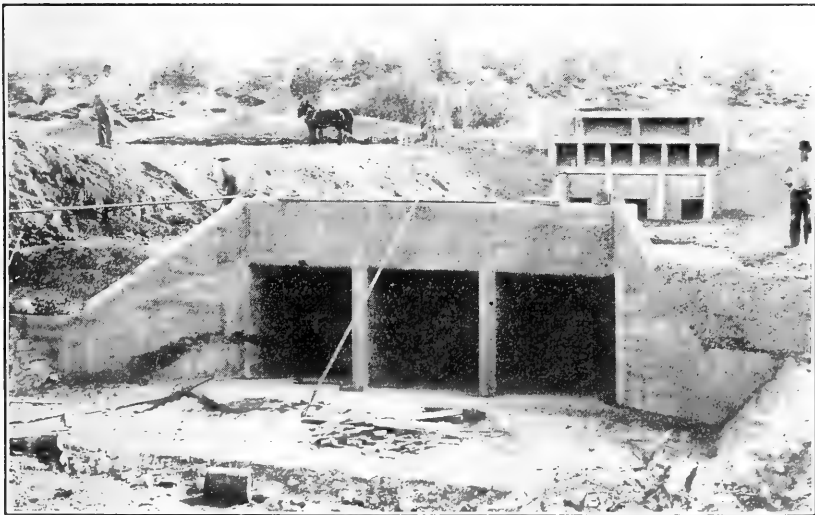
INTAKE END OF STORM CULVERT SHOWN IN FOREGROUND AND SIPHONS IN BACKGROUND.
